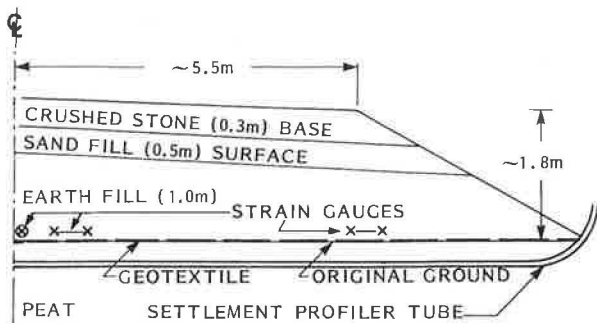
Manchester Detour Cross Sections showing construction and instrumentation details
